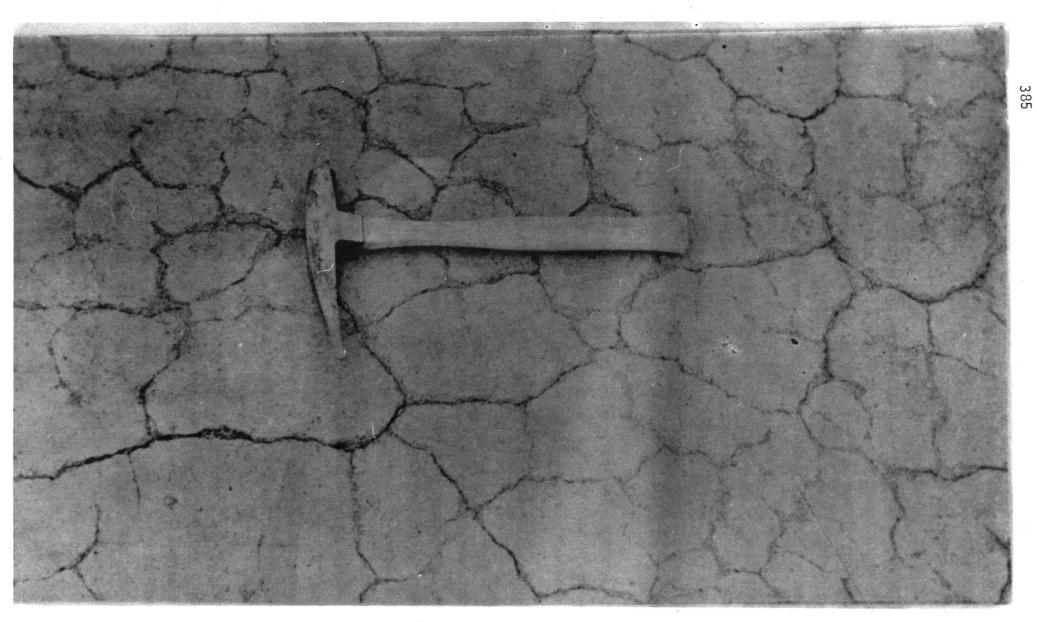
/1 : Surface crazing of concrete landing, Town Hall, Graff-Reinet That excessive shrinkage had, in fact, been responsible for all the features observed, was confirmed by laboratory experiments conducted by the National Building Research Institute (Stutterheim, 1954; Webb, 1959; Roper and Webb, 1961) and later by petrographic studies conducted by the Research and Development Laboratories of the Portland Cement Association, Illinois (Roper *et al*, 1965; Roper, 1969).
